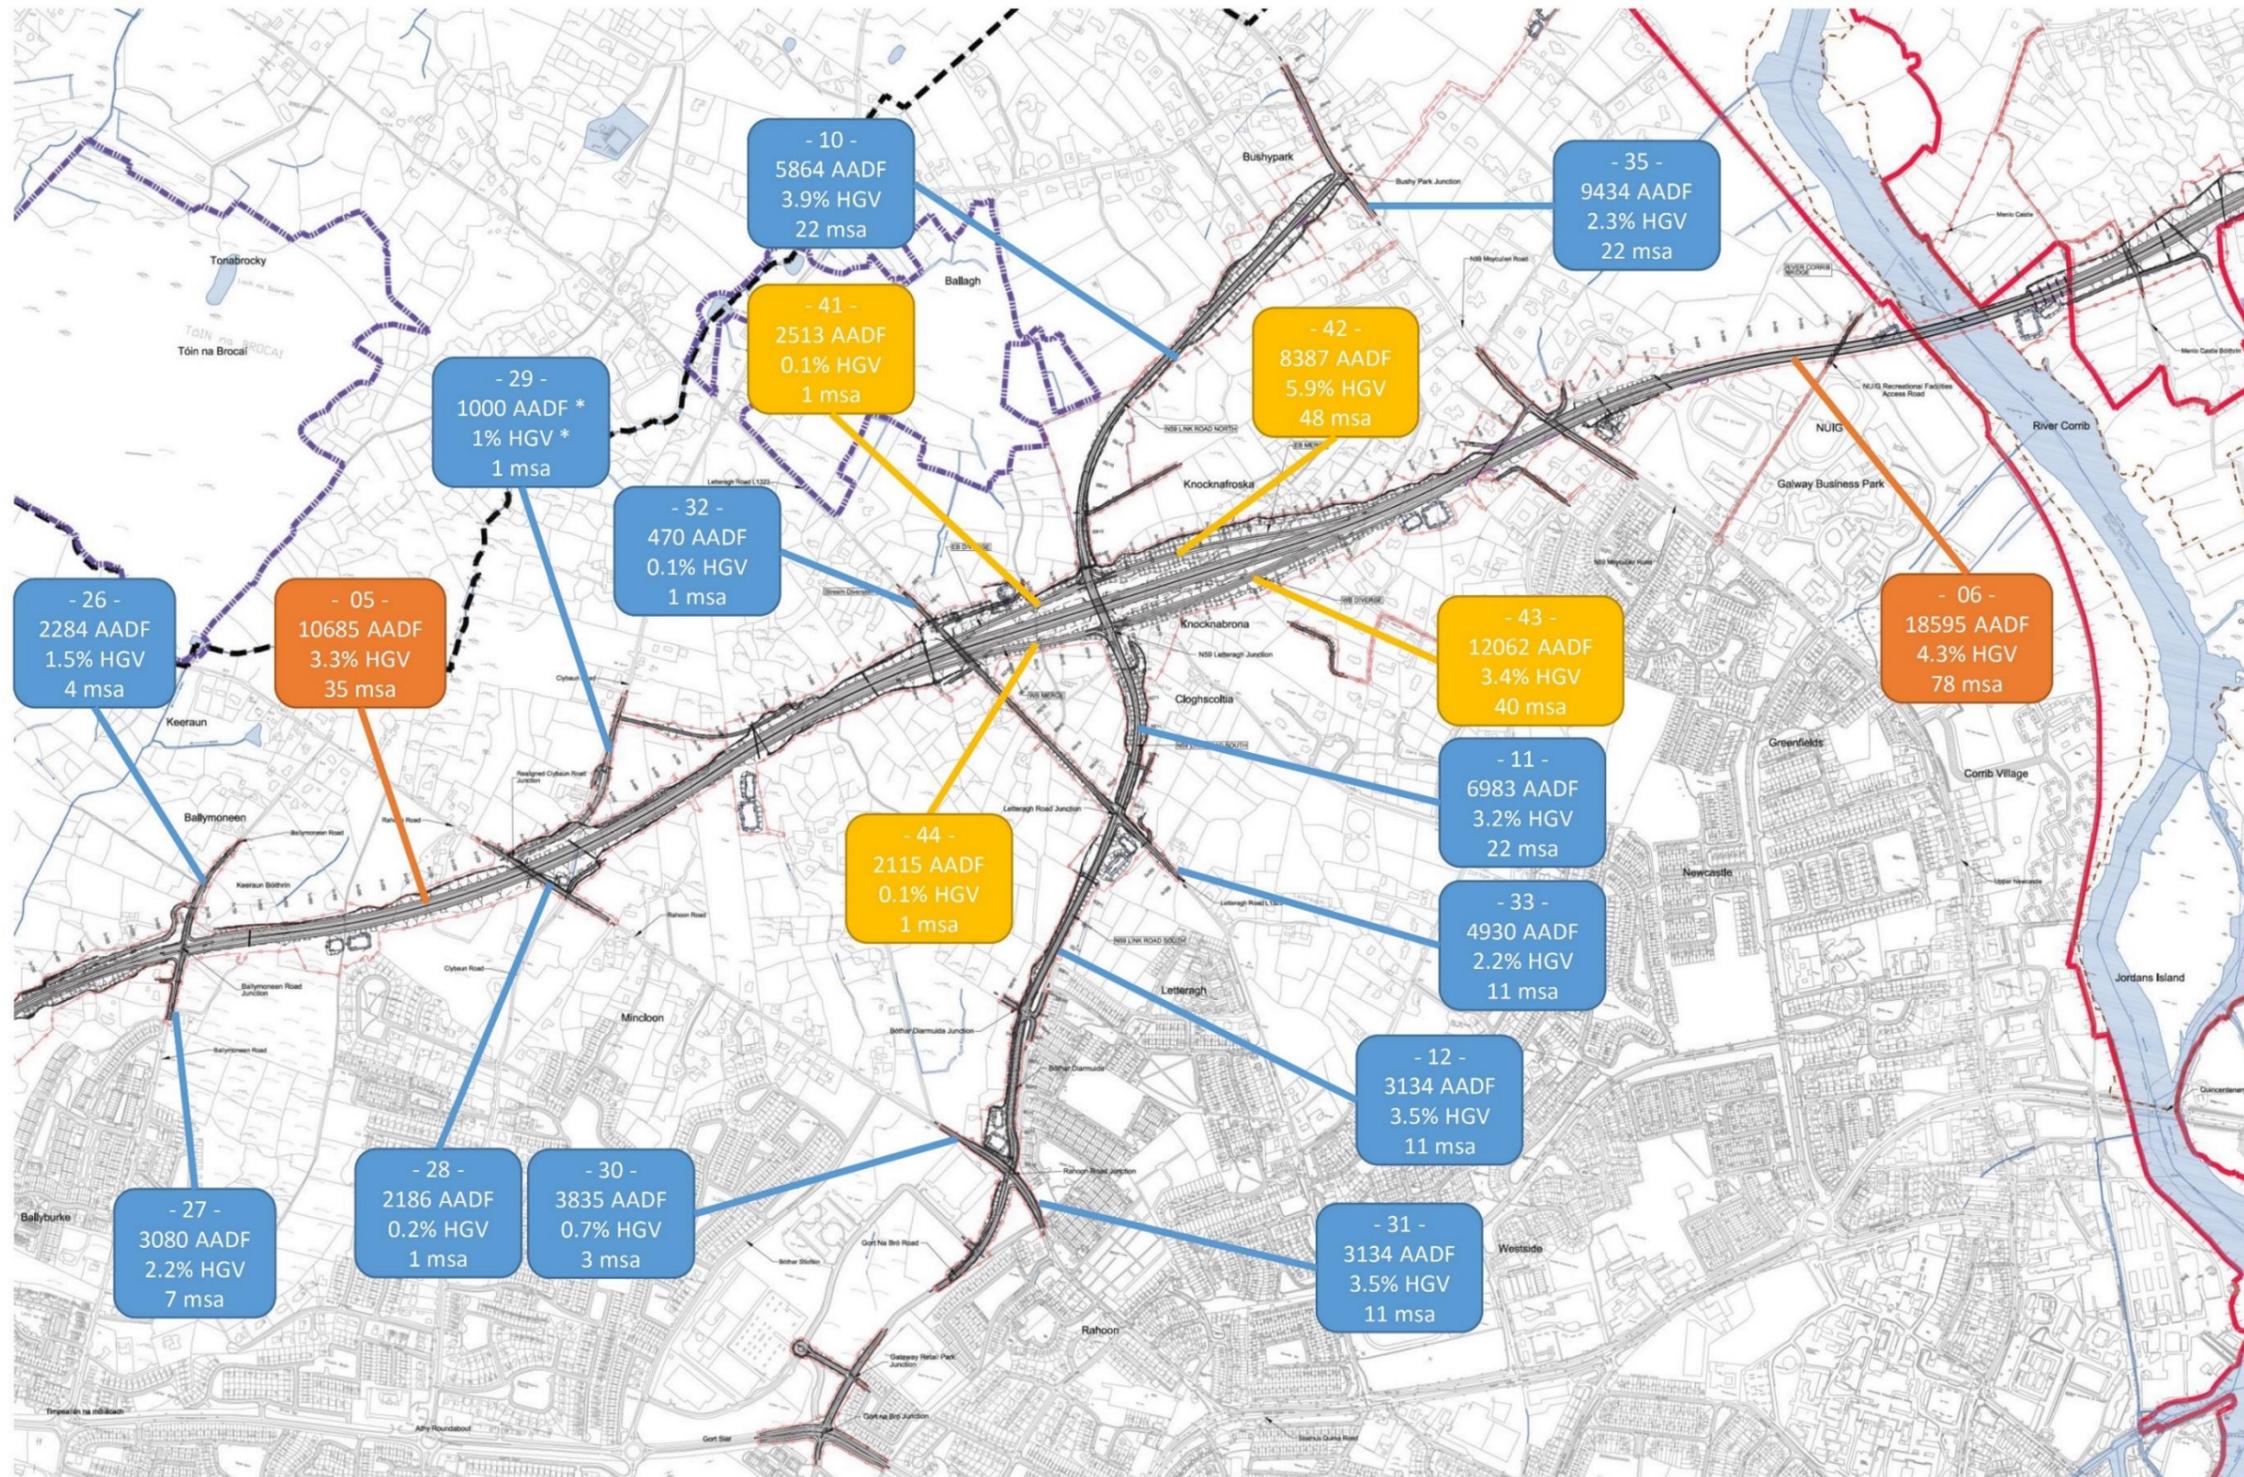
Visual aid showing locations of the pavement design criteria throughout the scheme – section 3/4
